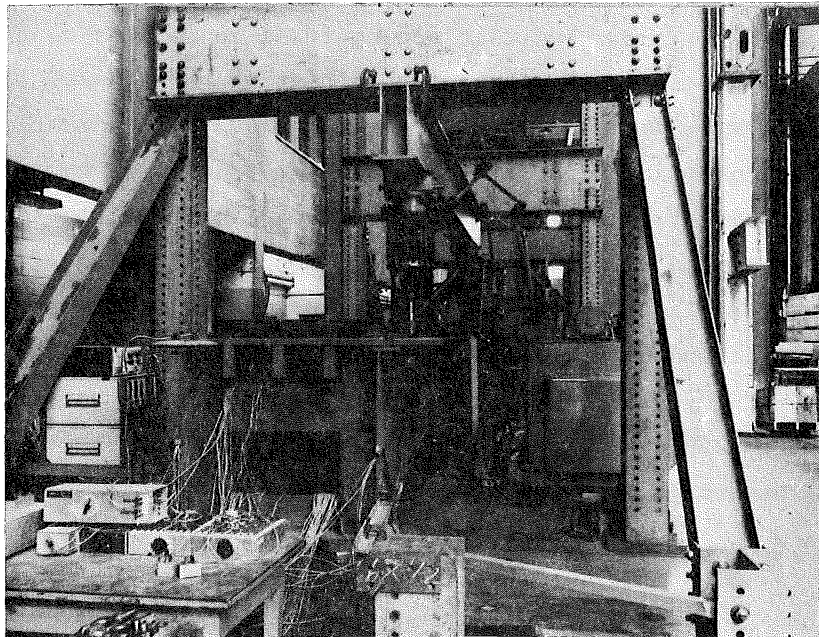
Test Setup Viewed from West Showing Loading Frame, Girder 3 and Instrumentation
